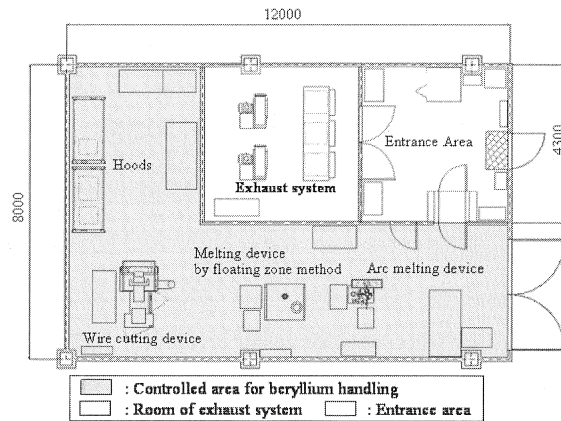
Plan view of the beryllium handling facility in the DEMO R&D building.
